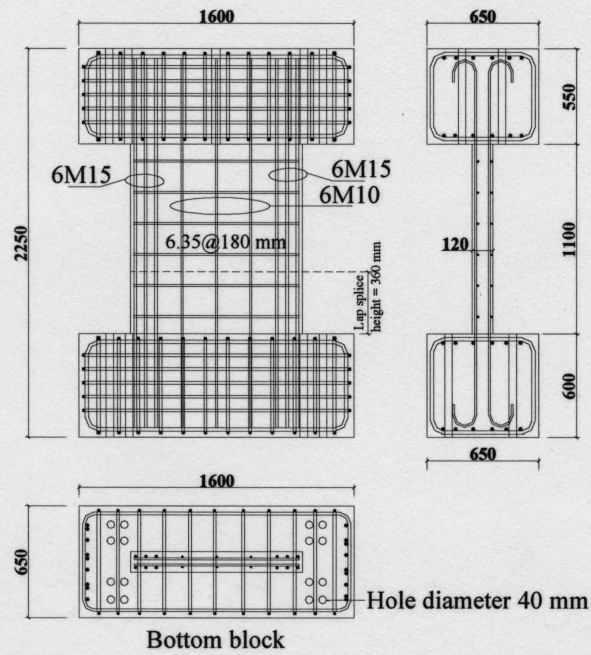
2 Reinforcement details for test walls CW1 and CW2
